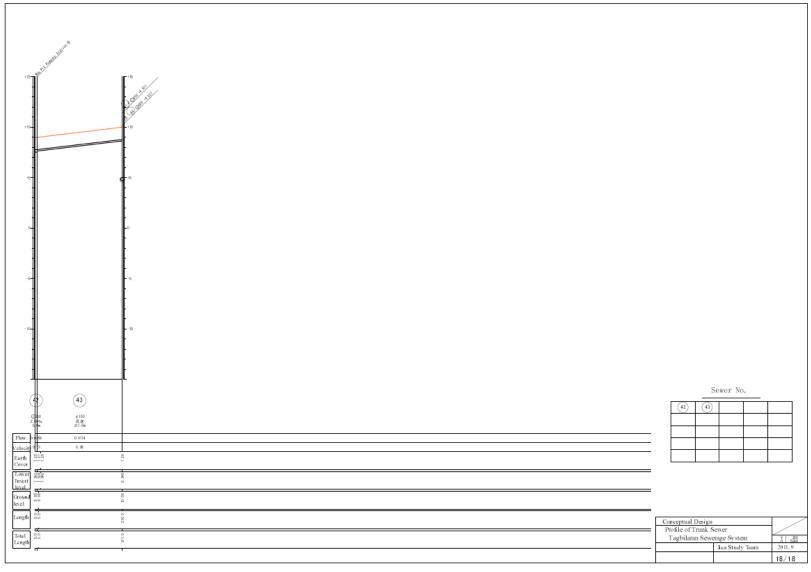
Profile of Trunk Sewer (Tagbilaran Sewerage System)
